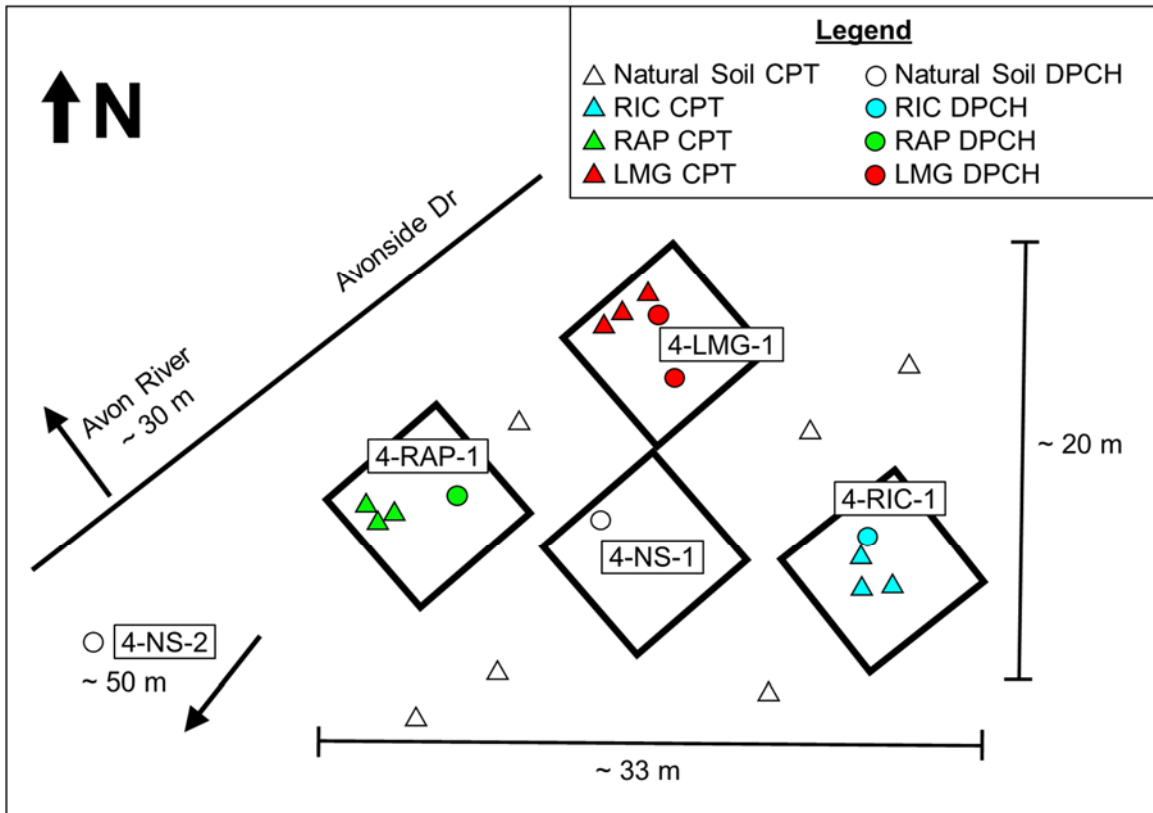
Location of CPT and DPCH tests performed at Site 4.
